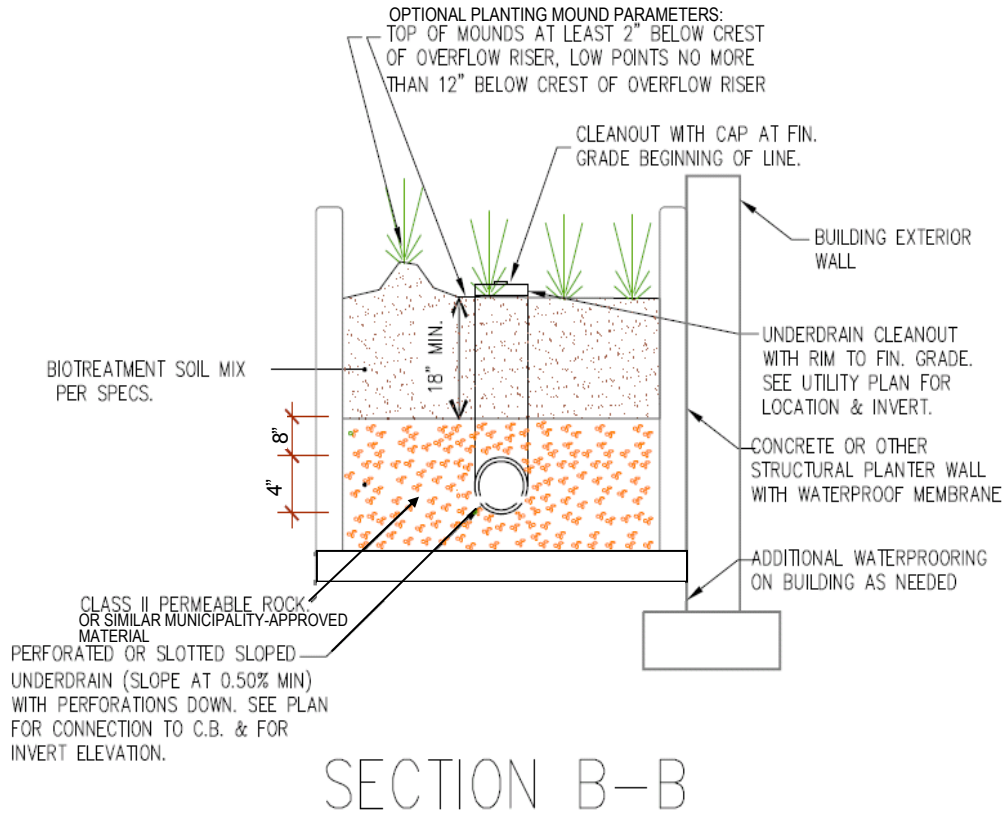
Cross section B-B of flow-through planter, shows cross section of underdrain
